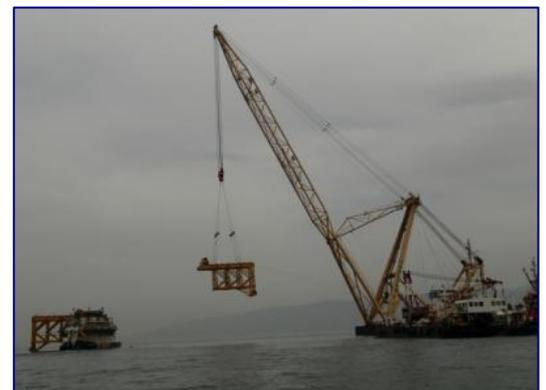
Installation of temporary steel platforms with floating crane “Taklift 7”
